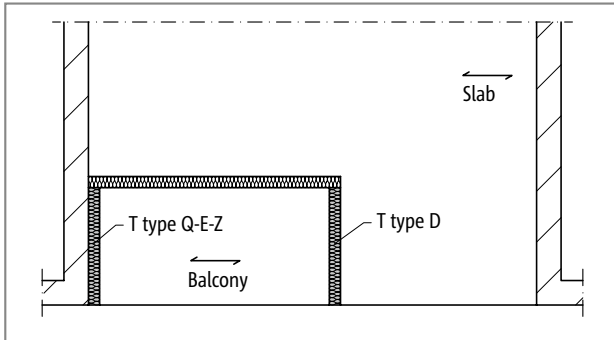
Schöck Isokorb® T type D, Q-E-Z: One-way reinforced floor
